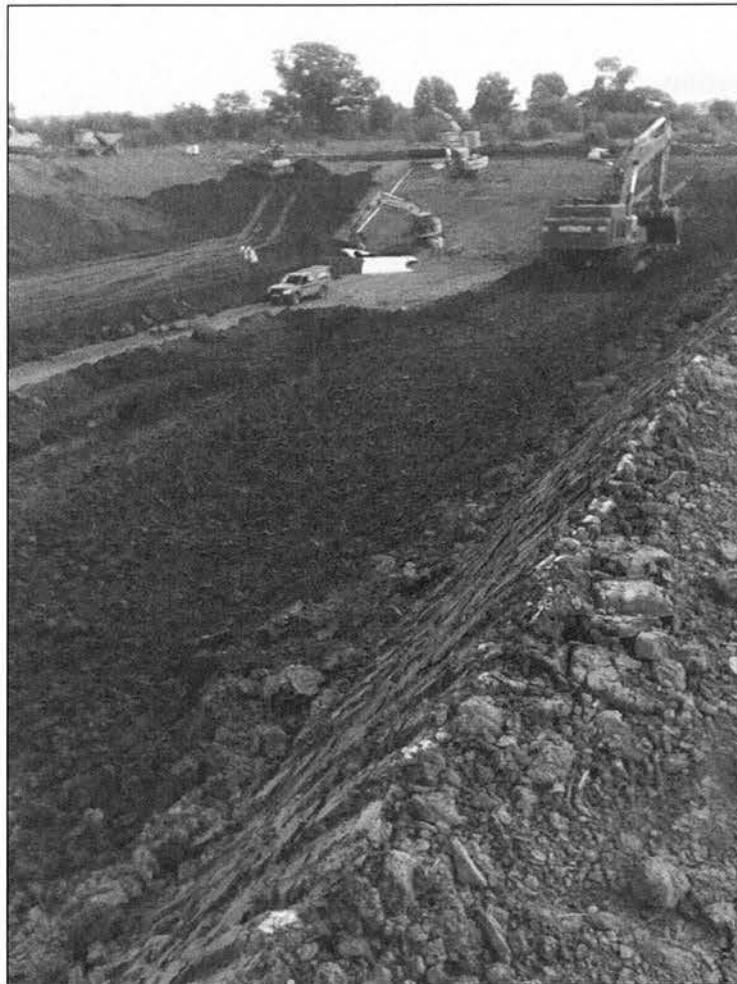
Landfill Cells K and L South (the adjacent cell group, SE of the 2009 excavation areas), under construction; south end, looking SE.
